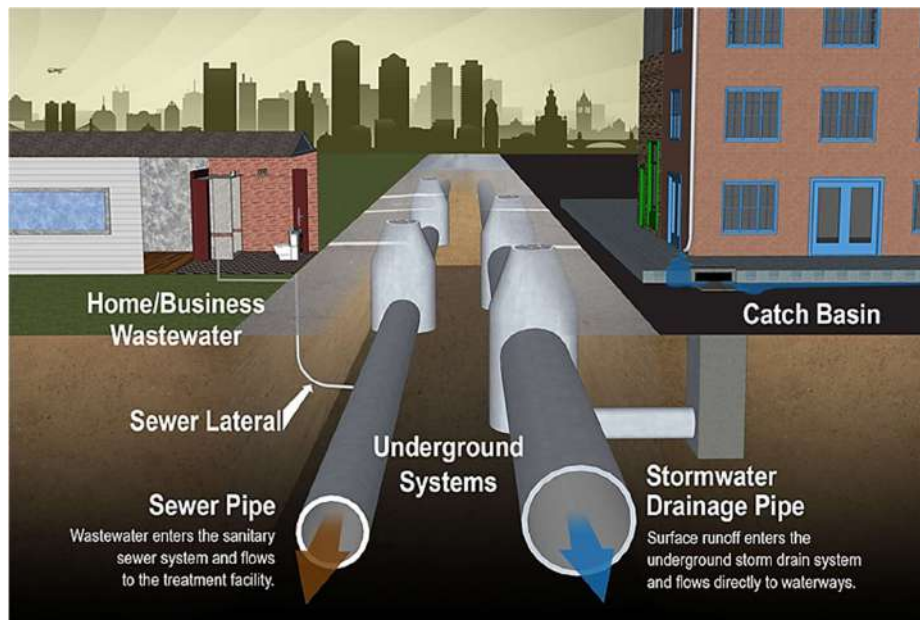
9: Stormwater flowing through underground closed pipe system (*Stormwater Drainage Conveyance Systems (Non-BMP related) General Design and Construction*, 2023)
